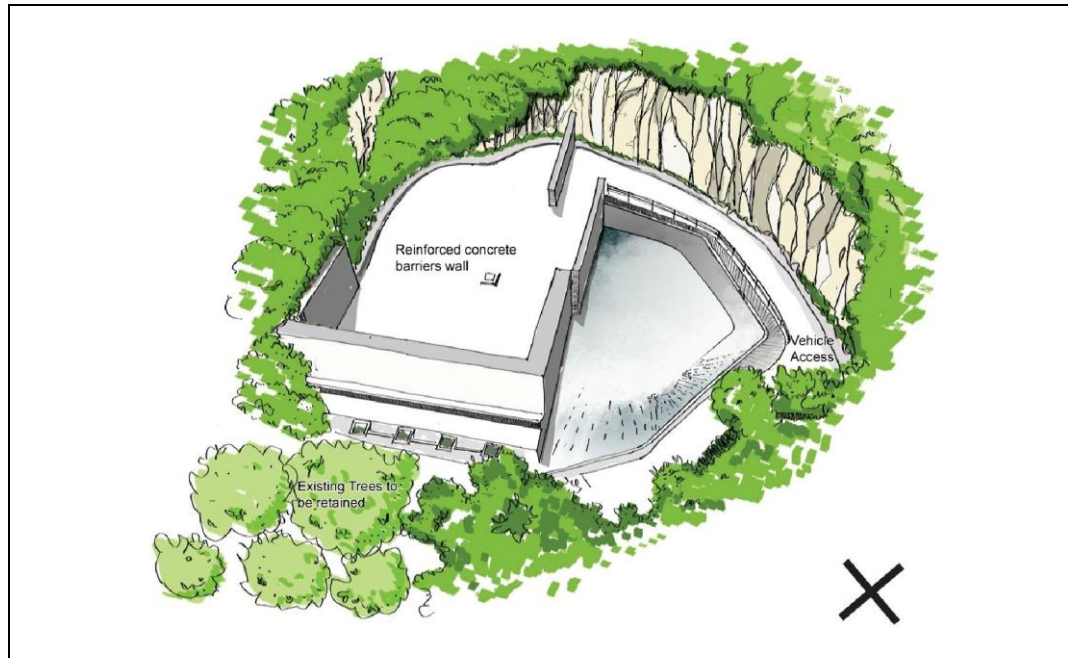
Reinforced Concrete Barrier Wall without any Treatment
